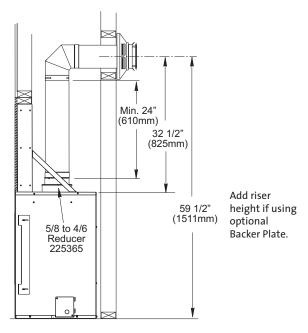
4/6 Horizontal termination with 2 ft. minimum vertical rise.
